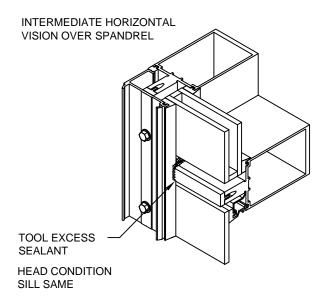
PLATES APPLY A GENEROUS AMOUNT OF SEALANT TO THE JOINT PLUG FACE FILLING JOINTS AS SHOWN.
